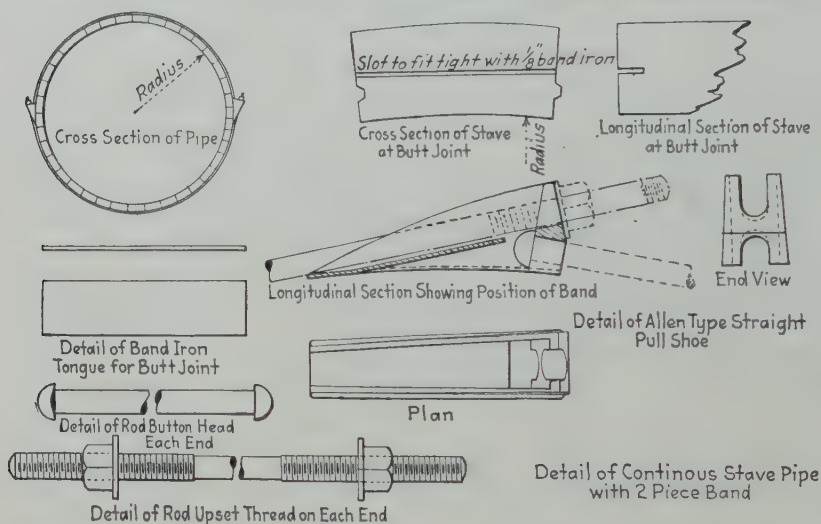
Details of wood-stave pipe construction. (Redwood Manufacturers Company.)
